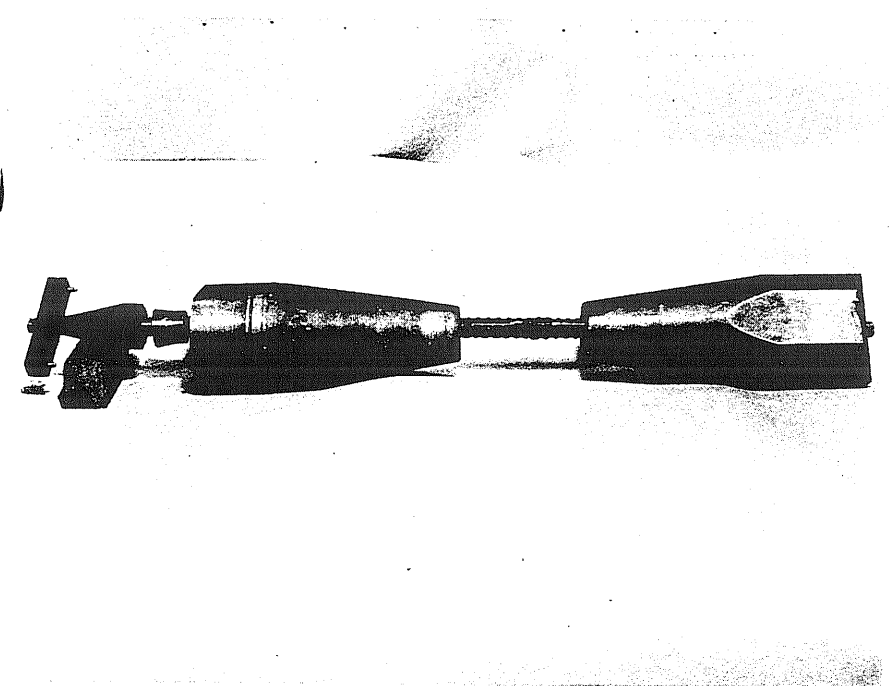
VIEW OF SPECIMEN BEFORE CASTING THE GRIPS
